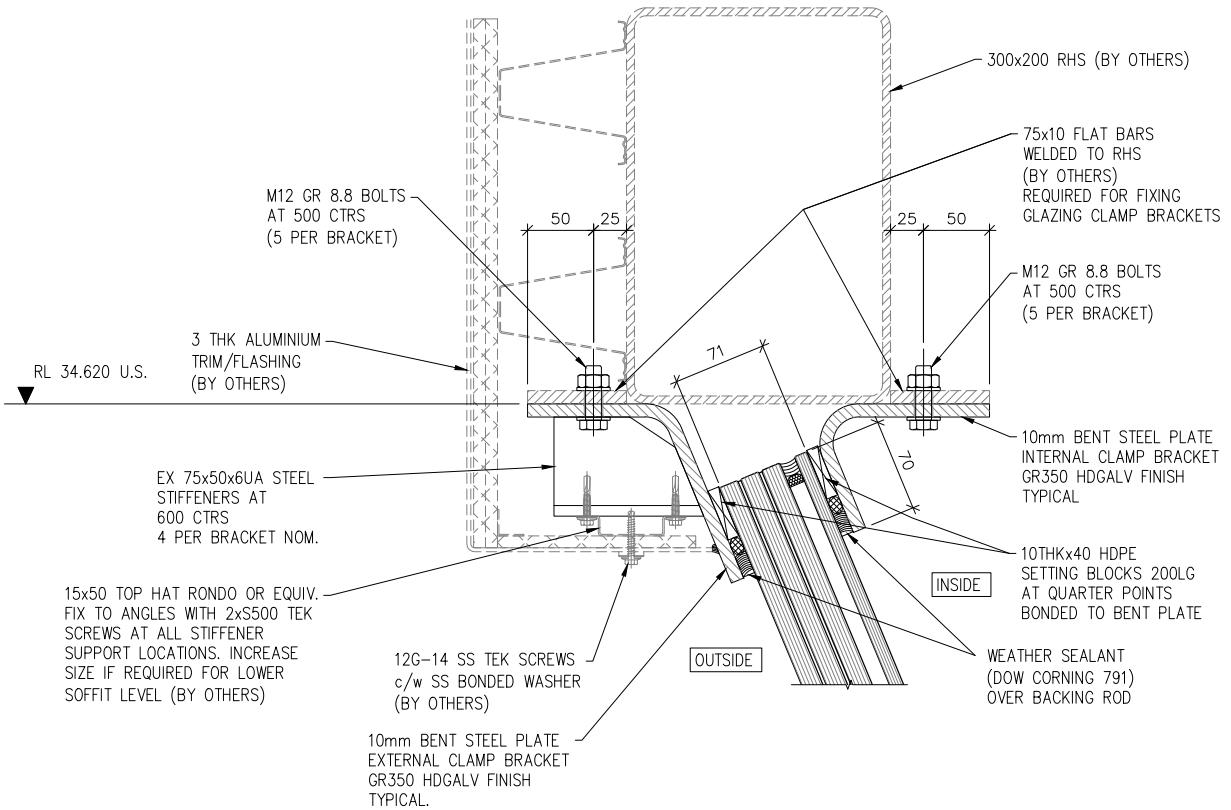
IMOC Tower Level 6 VTS façade detail. © JML-Craft
